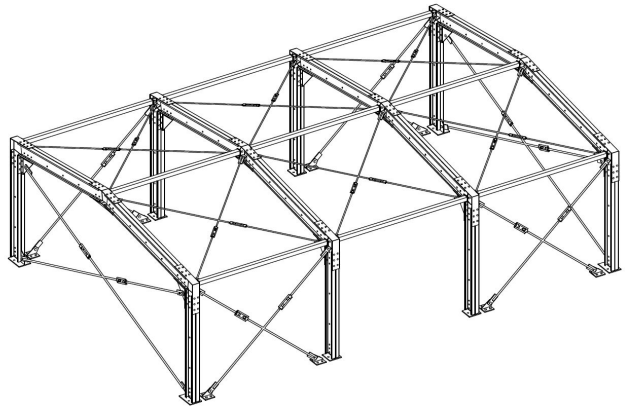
Braced structure: Structure with roof bracings and without purlins and sandwich panel cladding.
